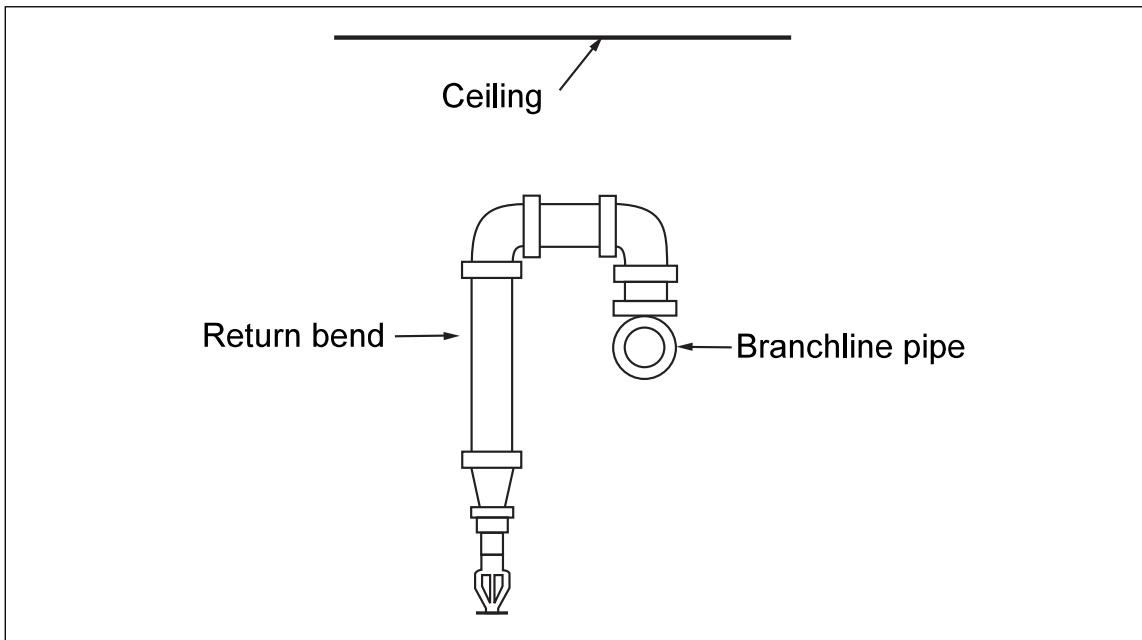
Example of a return bend for Nonstorage sprinklers
